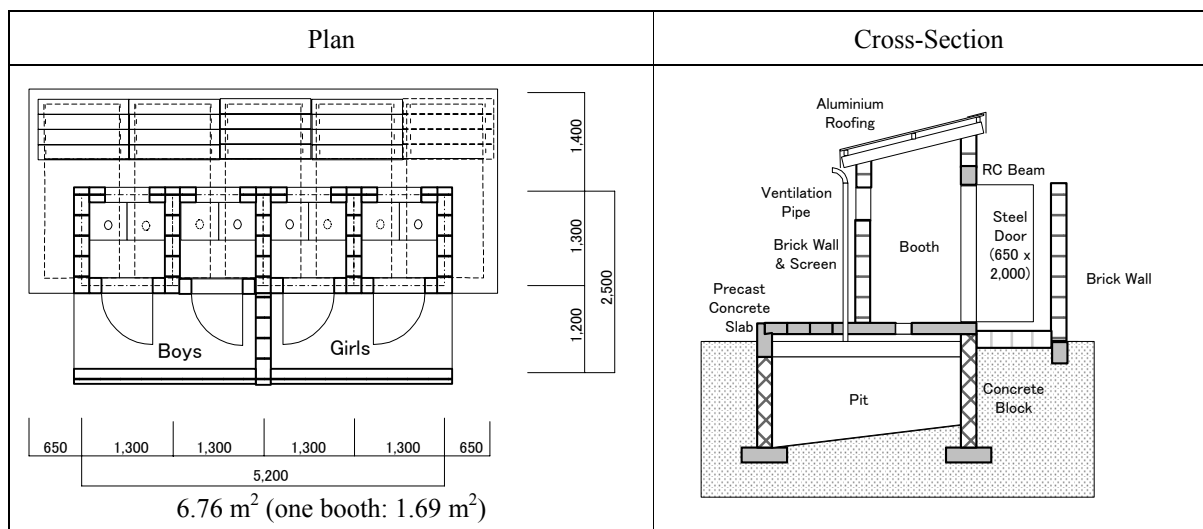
Standard Design Drawings for Toilet Building
